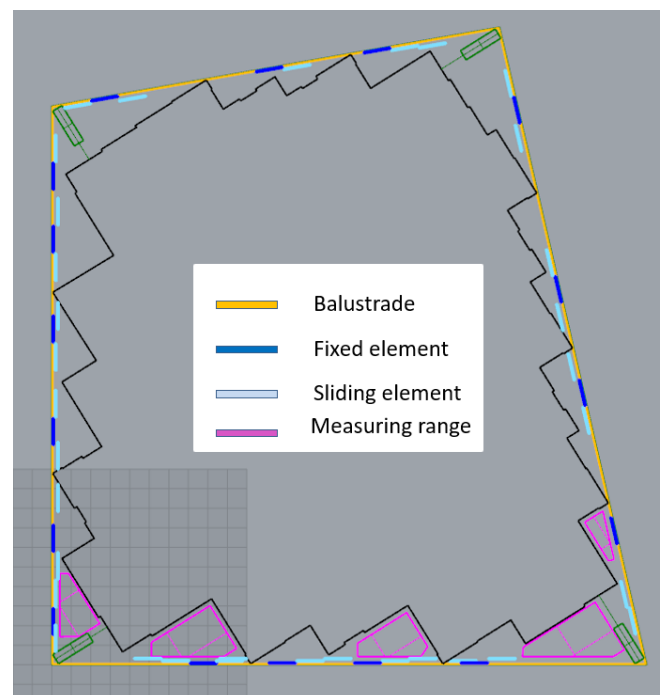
Example of a floor layout. Every floor has a slightly different layout.
